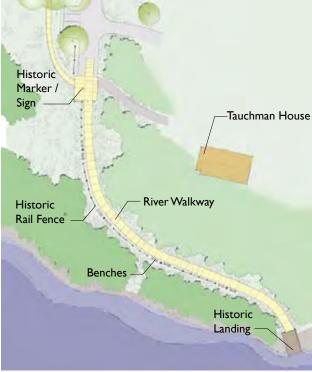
Proposed River Gateway at End of Boones Ferry Road
